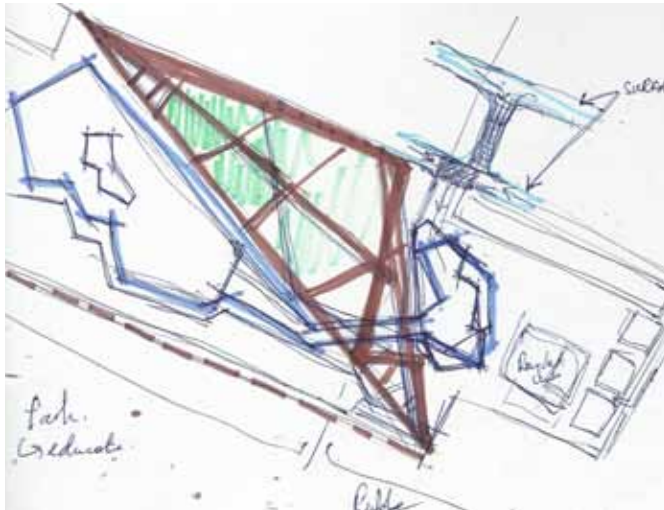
SITE PLAN REVISION 6 (AUTHOR, 2011)
